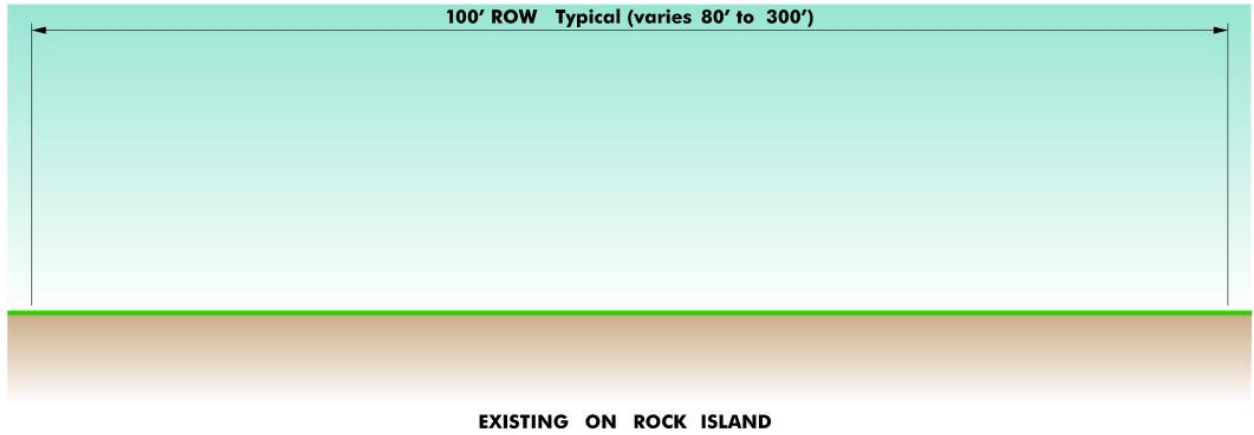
Enhanced Streetcar Typical Section - Rock Island Railroad Existing Conditions
